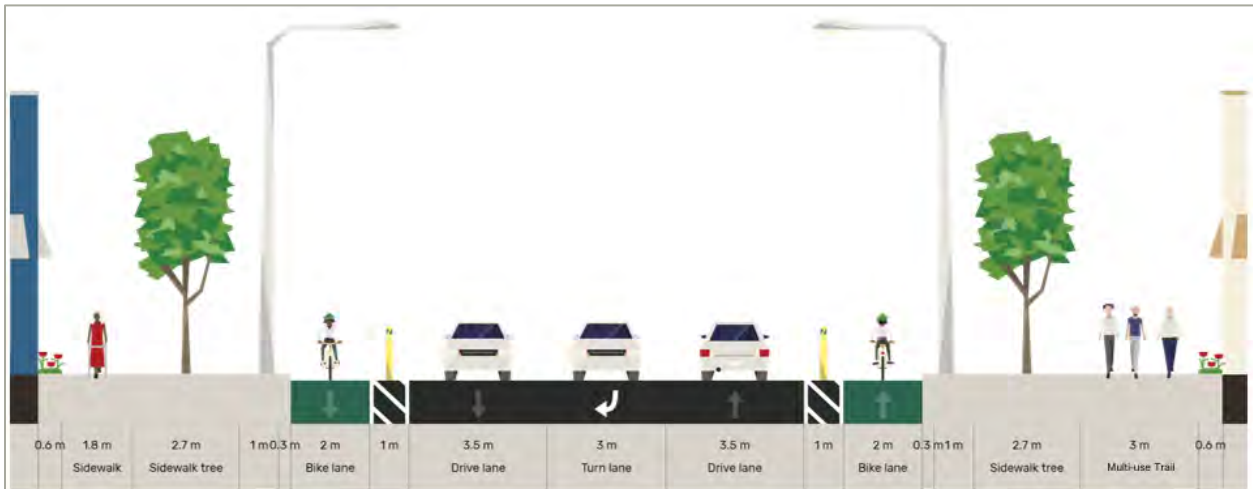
Typical Cross Section, 30m Type C Arterial with Class I trail (In-Boulevard Multi-use Trail) and On-Road Cycling Lanes (Bike Lanes)
